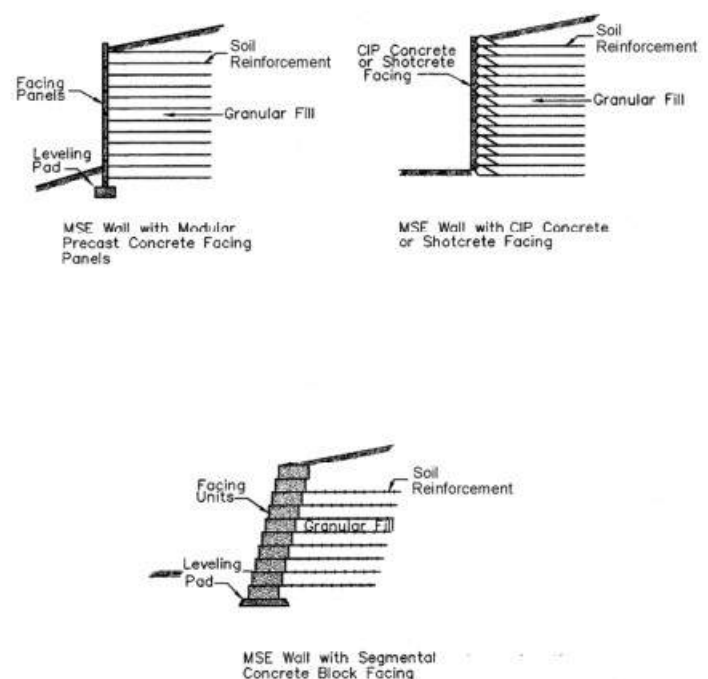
Typical Mechanically Stabilized Earth Walls
